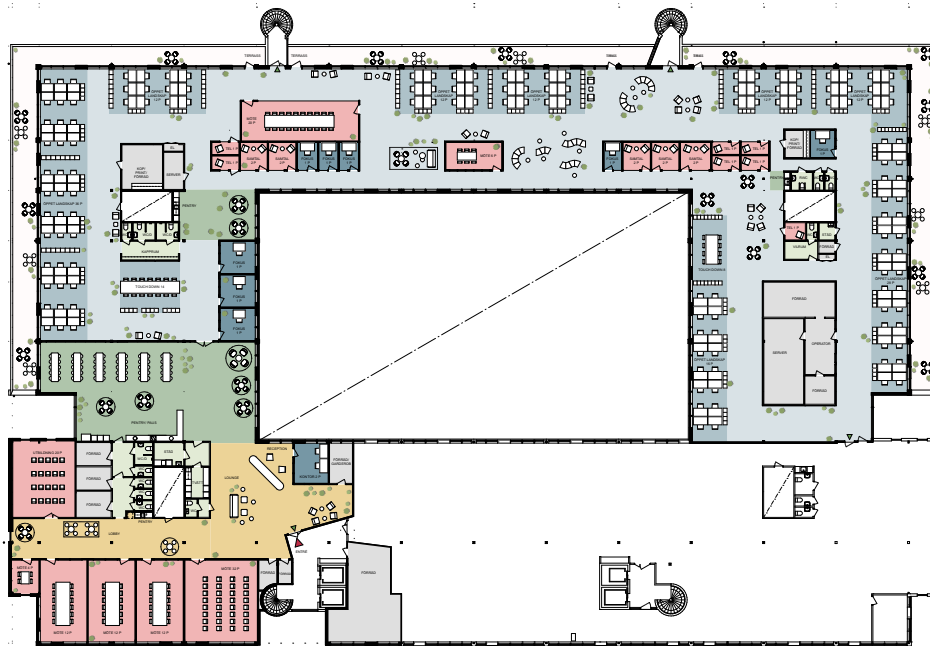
Floorplan of Rotterdam floor five where materials was collected for Kv. Färöarna
